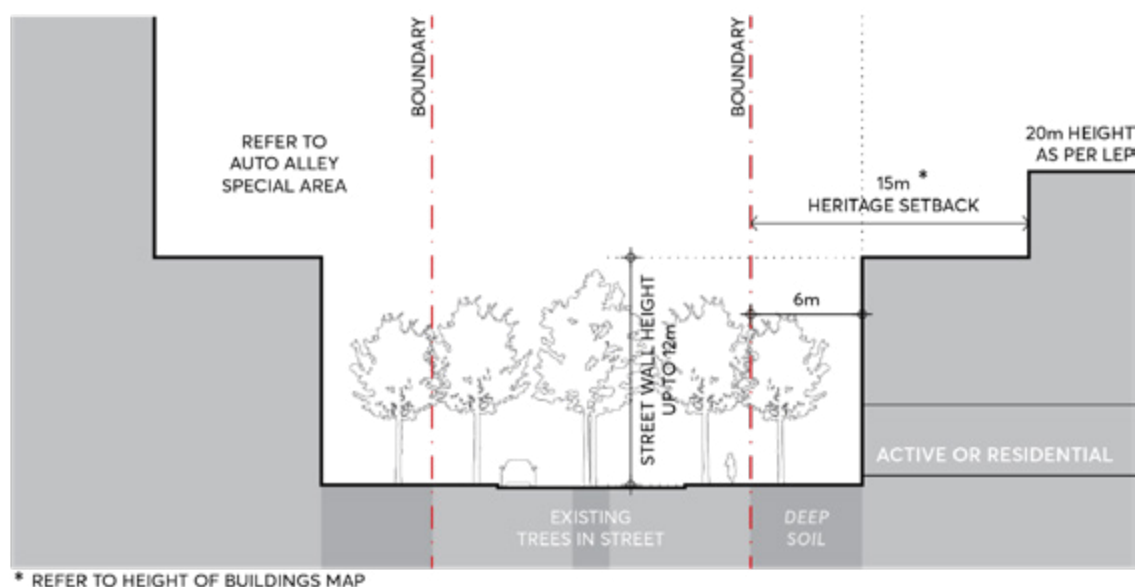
High Street (Section B) Setbacks and Street Wall Height
